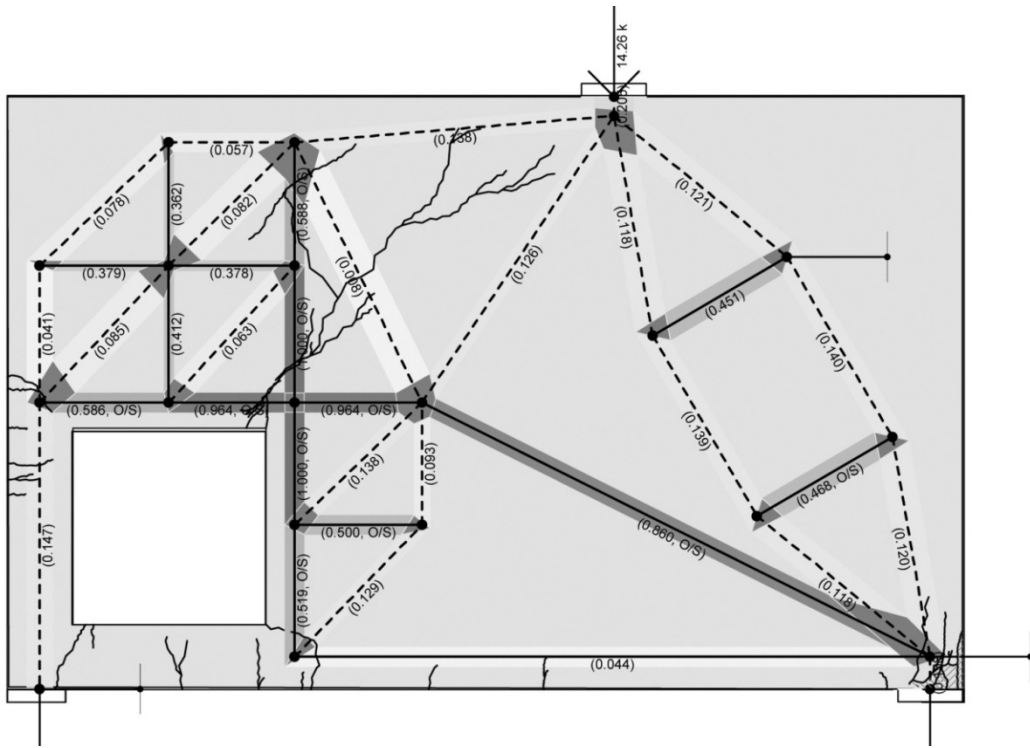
CAST model of RC specimen considering concrete's tensile strength with crack mapping overlay
